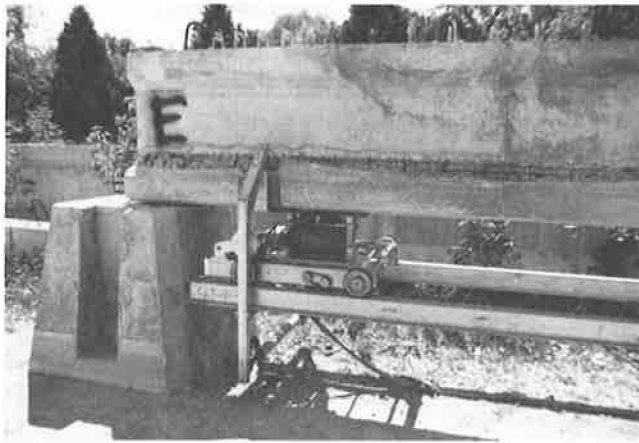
The MFD instrument during test of a rejected bridge beam.
